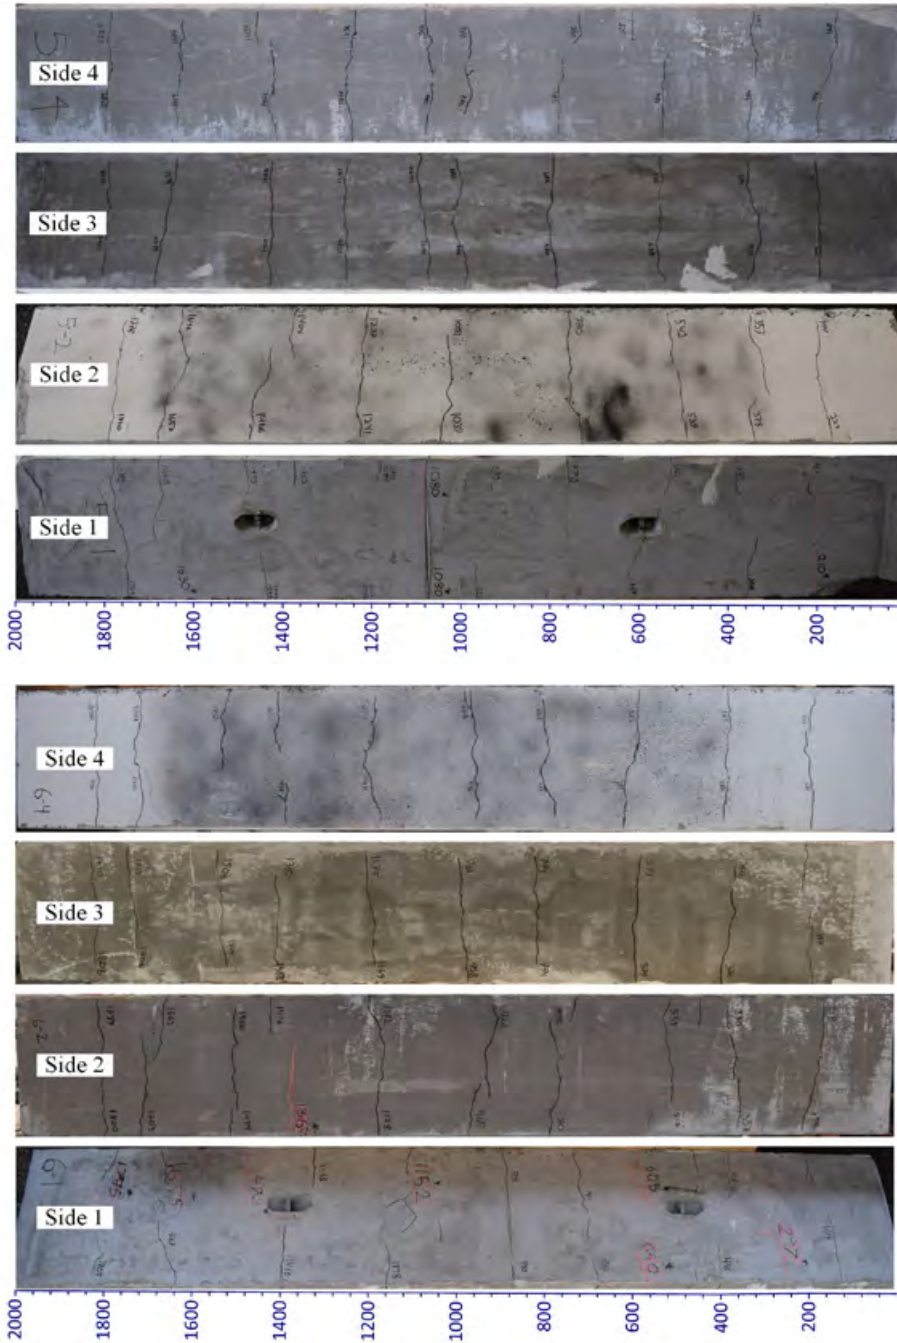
(b). Crack spacings of specimen set 3 (scale is in mm).
